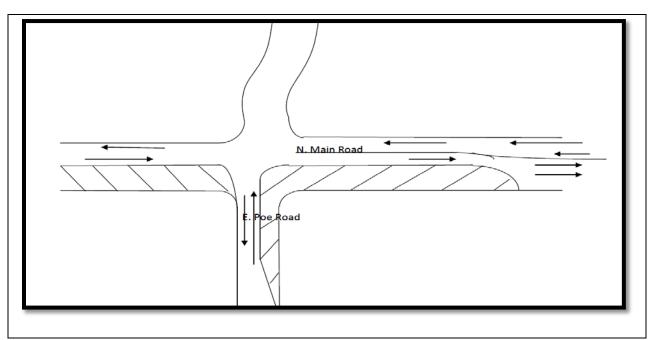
Shows a typical traffic control plan 4 for open cut where 2 lanes are closed for traffic
